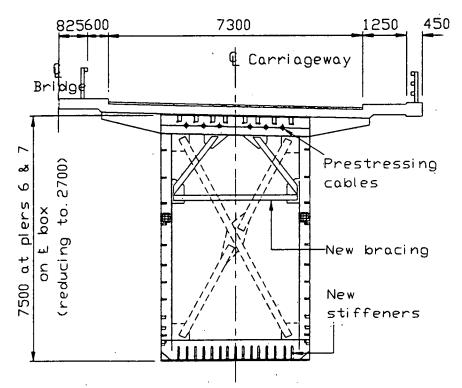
Friarton Bridge section, showing strengthening (87).
